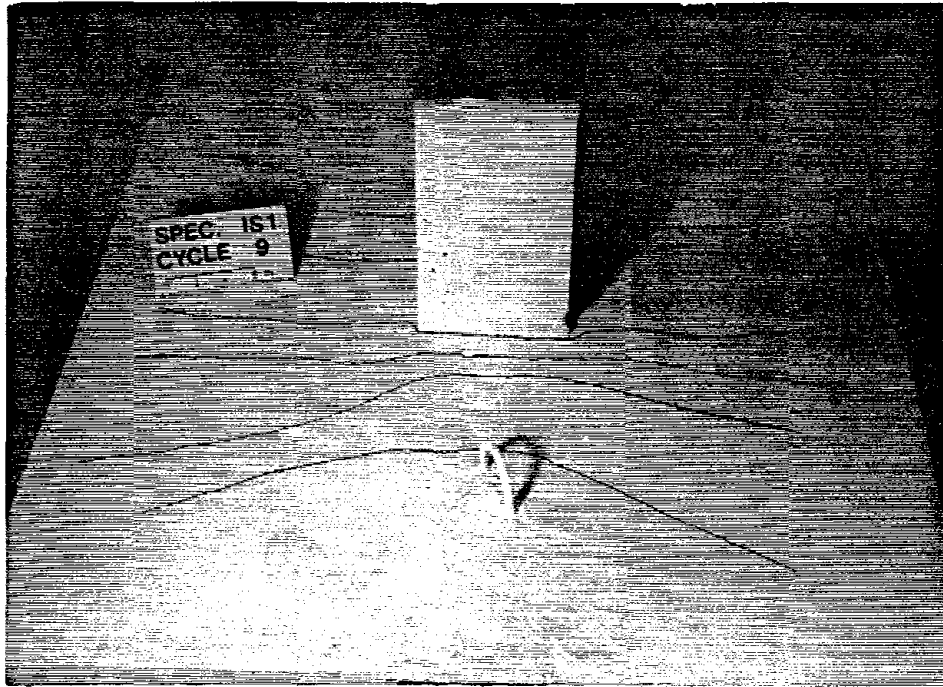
(a) Transverse Cracks in the Slab of Specimen IS1
